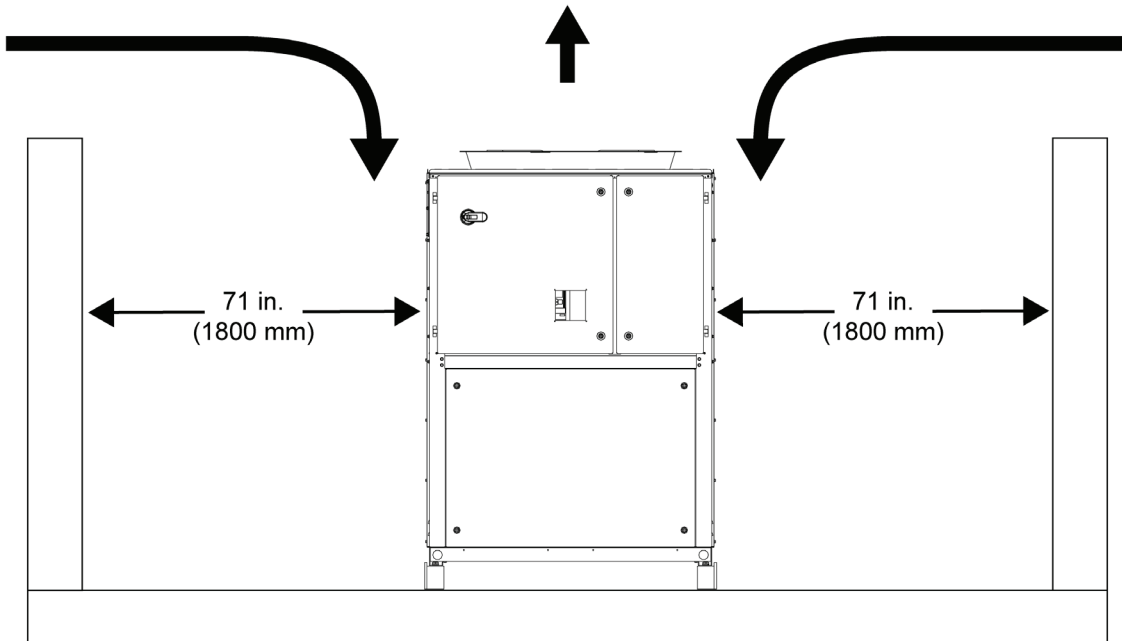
Space Requirements - Installation with Wall Higher than Unit
